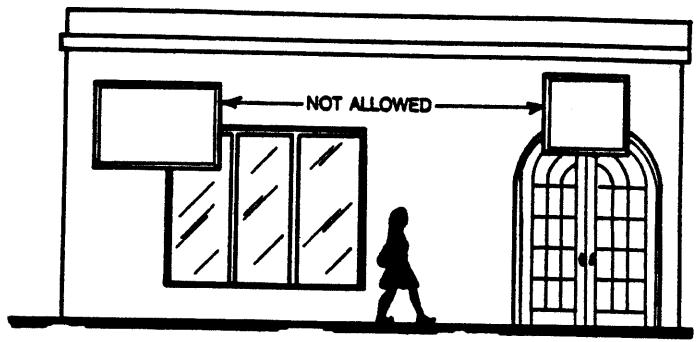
A Building Sign May Not Disrupt Architectural Features of the Building
